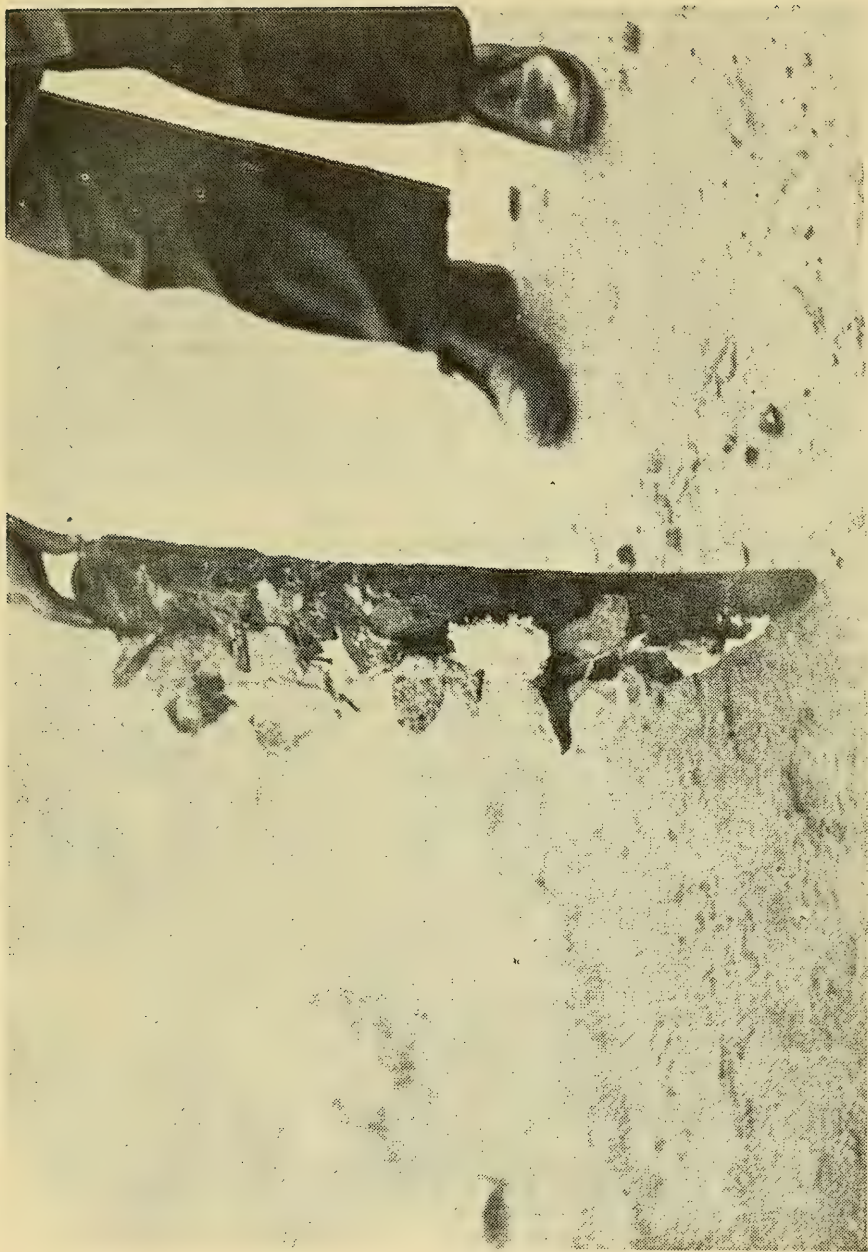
Westkapel sea dike. A fragment torn out of the rubble stone protection penetrated with asphalt mastic.
